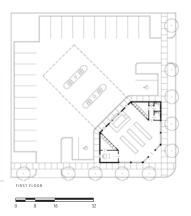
Prototype Site Plan for Corner Gas Station. Source: Duany Plater-Zyberk & Company
